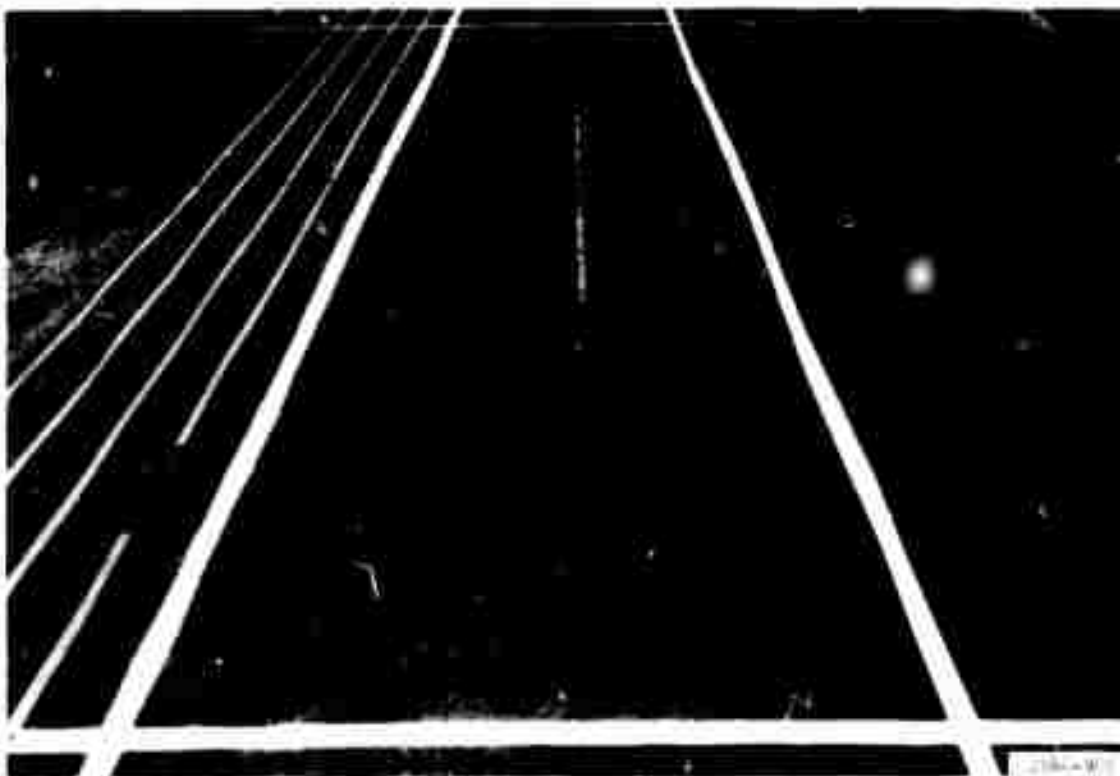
Item 3, lane 2, flexible pavement test section, prior to traffic
